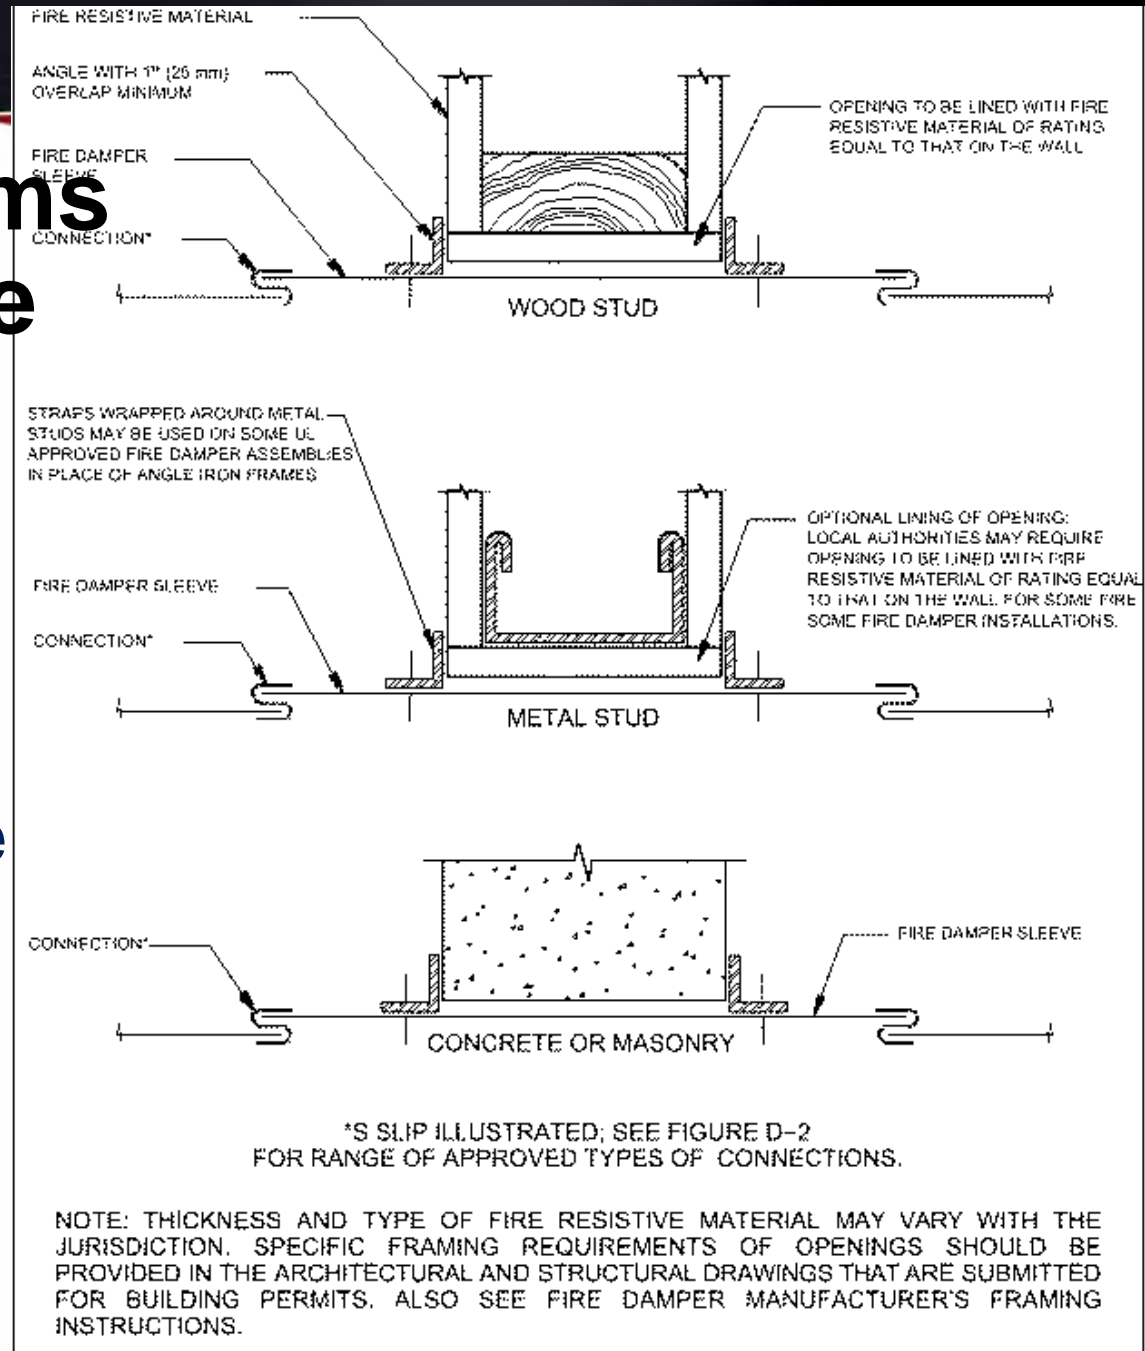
FIRE DAMPER OPENING PROTECTION
